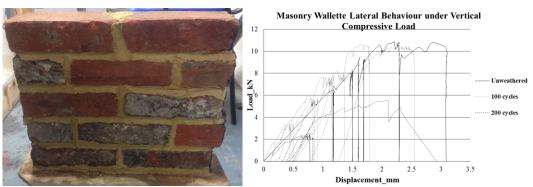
Masonry wallette specimen (left) and comparative assessment of weathered and unweathered masonry wallettes (right)
